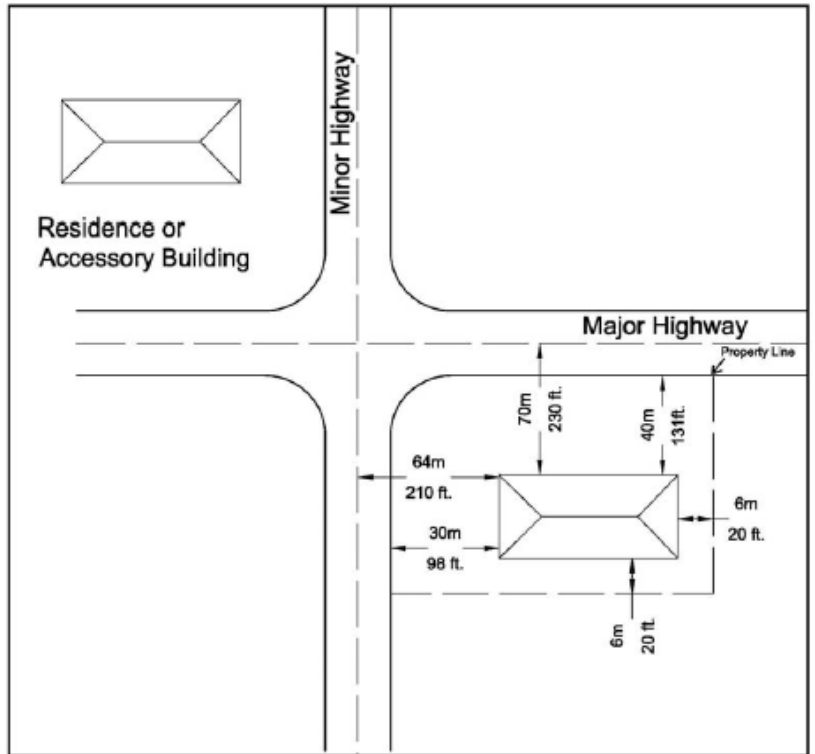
Setback for Dwellings & Accessory Buildings from Highways
